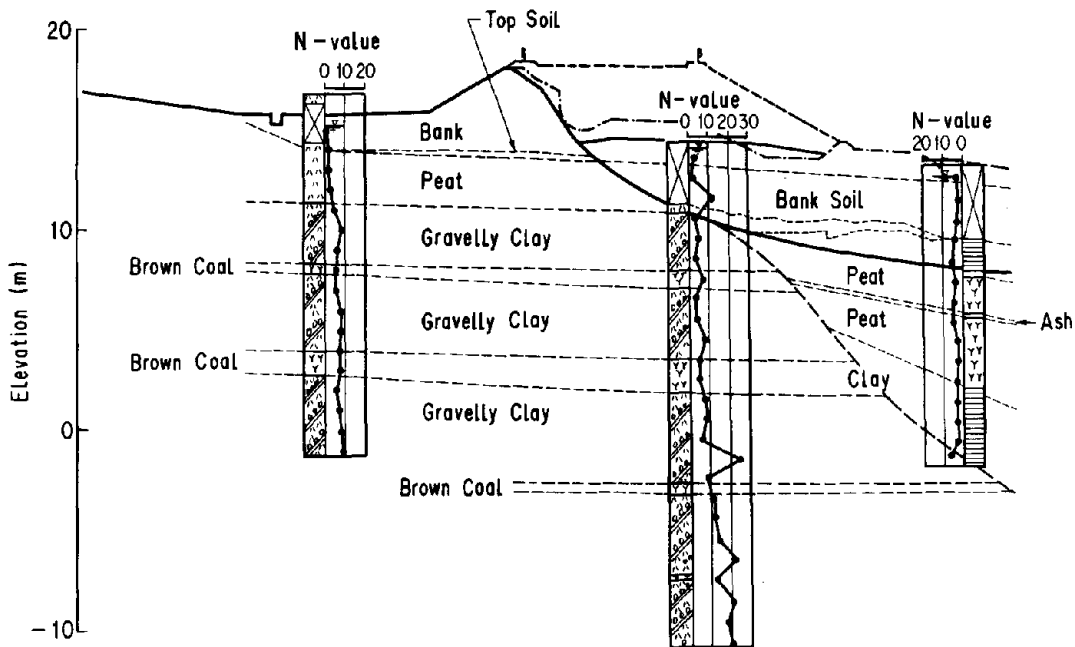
Cross Section of Collapsed Embankment on National Road 5 at Chirai, Oshamanbe
